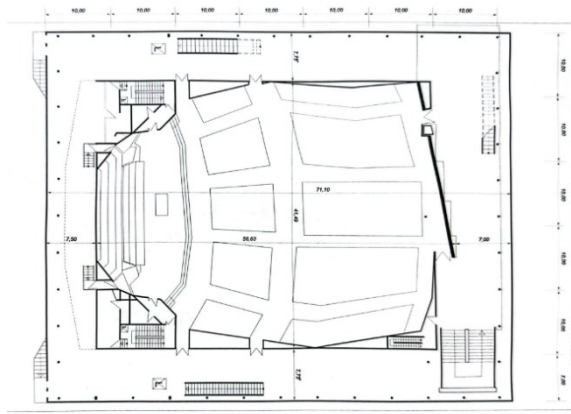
Plan layout of Vatroslav Lisinski Grand Hall.
